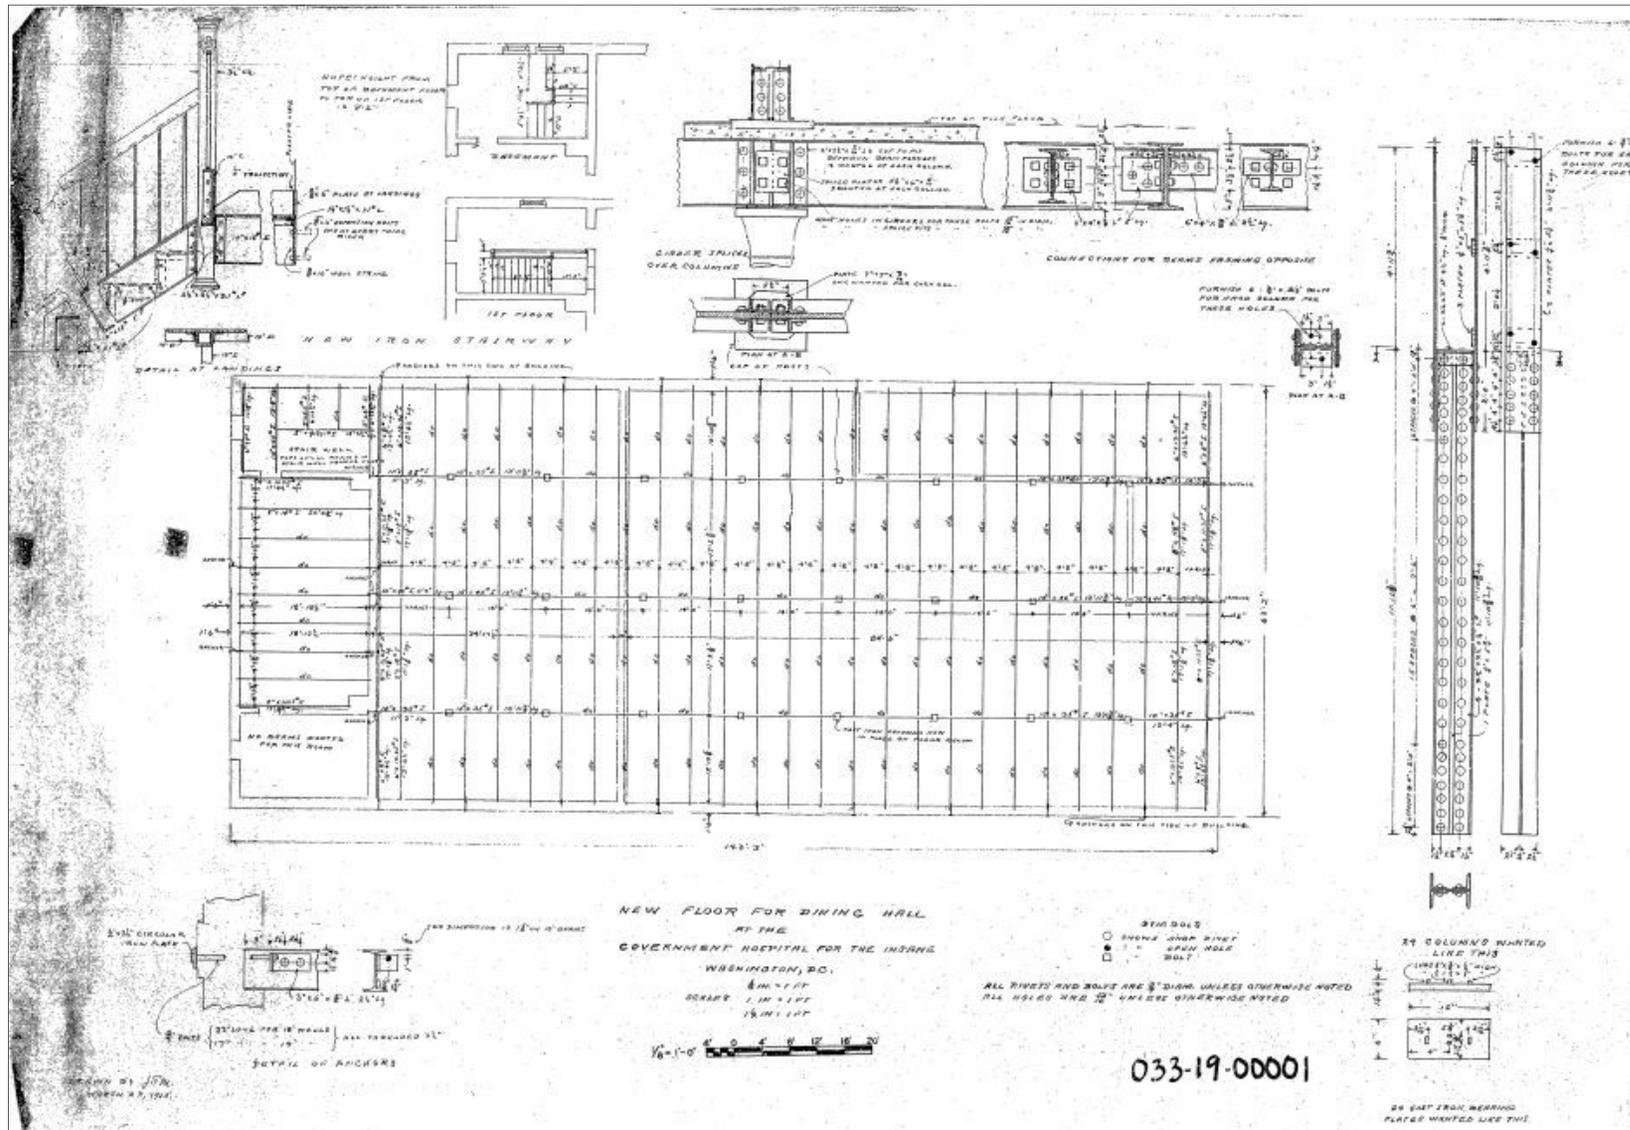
1915 construction documents outlining alterations to Dining Hall, including new first floor framing. Source: GSA archives, image DC1452SE0103.
